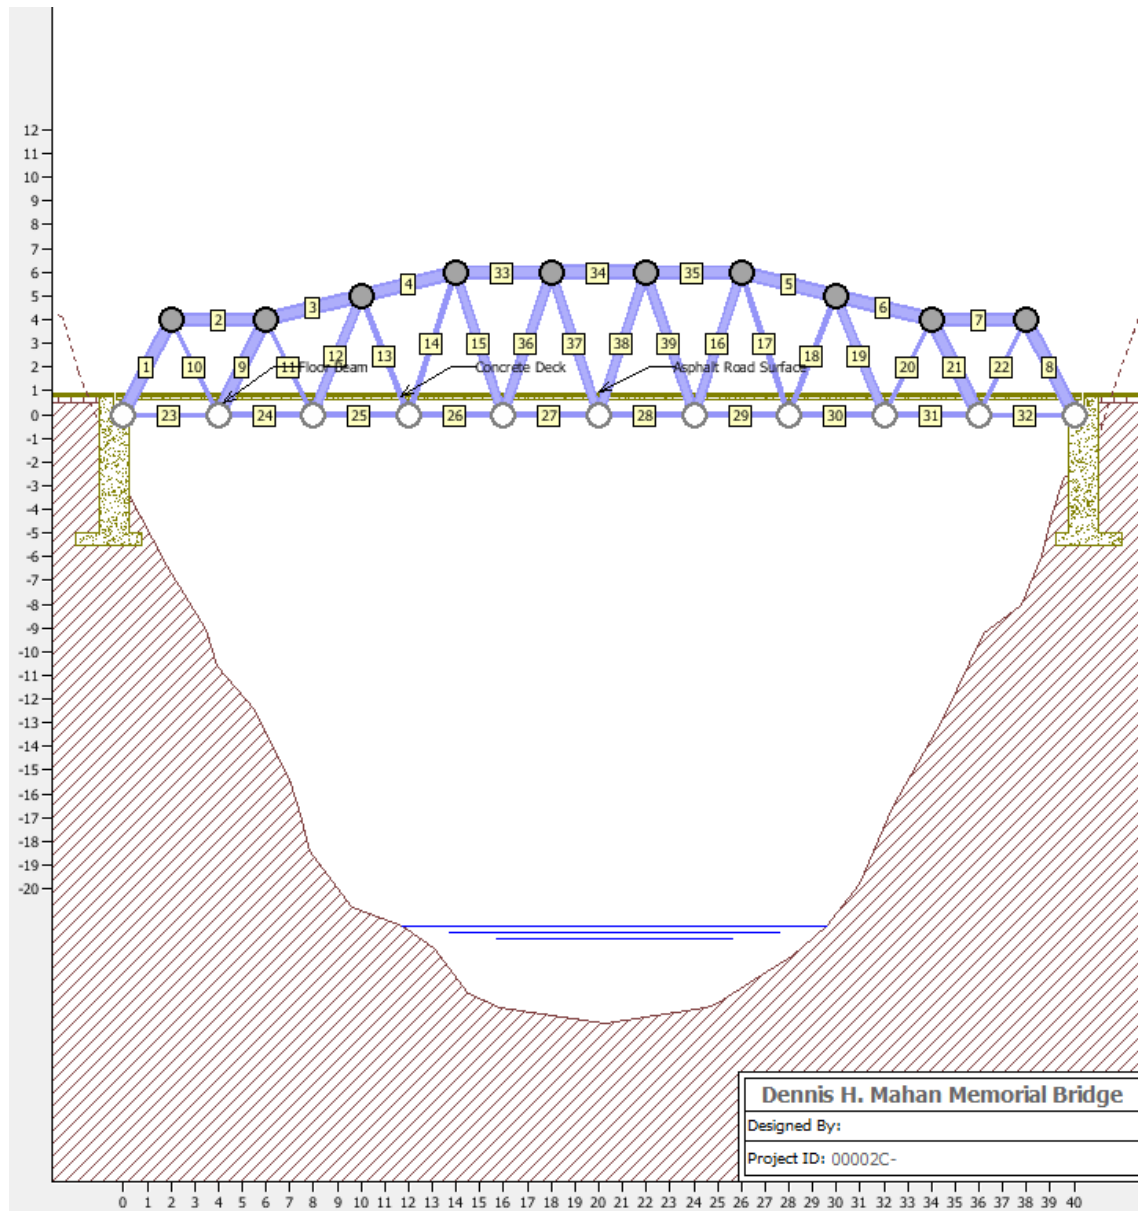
Warren Truss Bridge Model from Bridge Designer 2016
